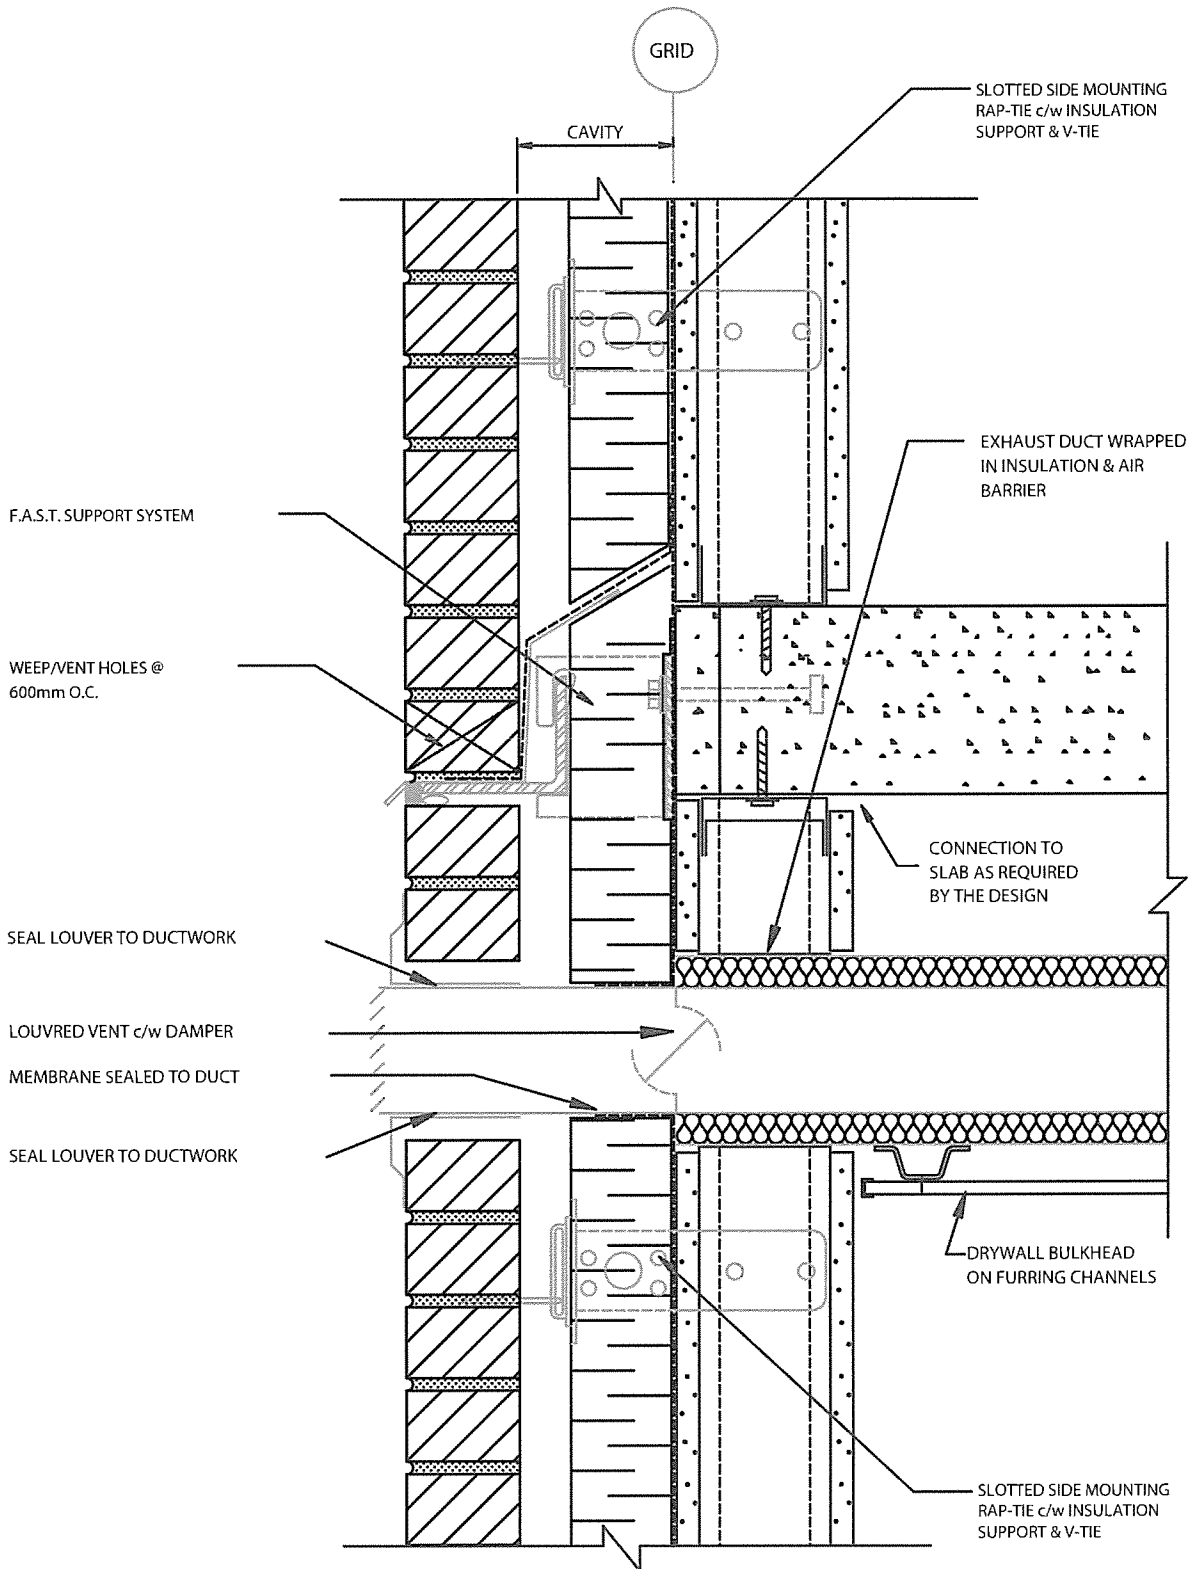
BRICK VENEER/STEEL STUD - EXHAUST VENT DETAIL
